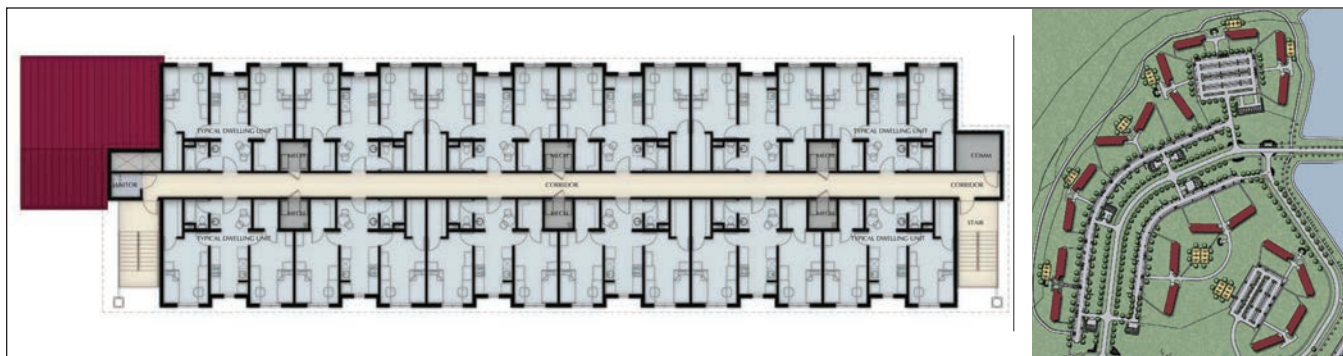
(left): Typical floor plan for military barracks project. Figure 5 (right): Site plan for military barracks project.
